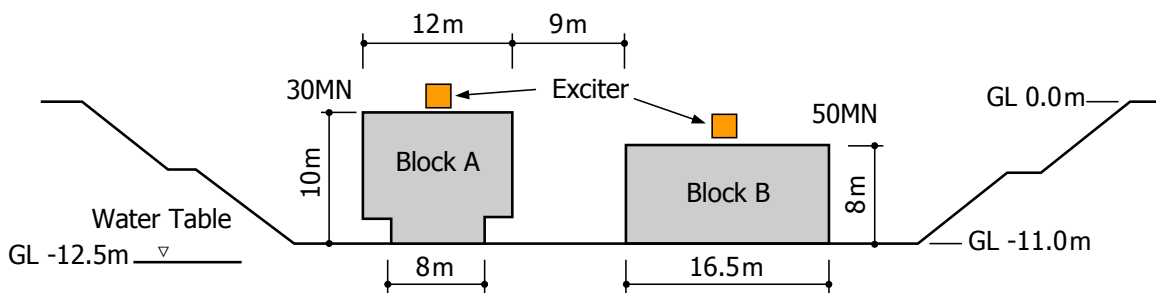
Forced Vibration Tests on Concrete Block Specimens
